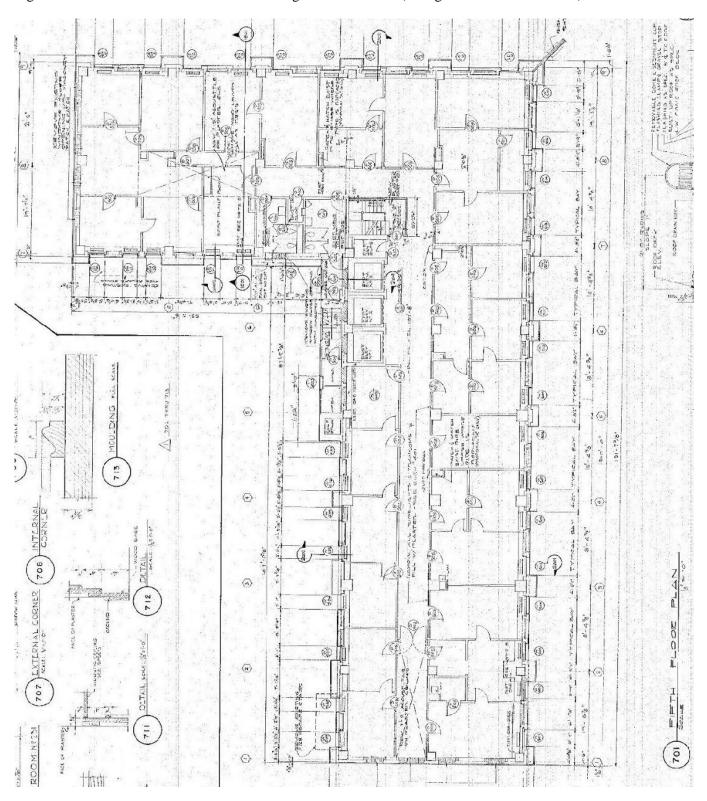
First Wichita National Bank Building Sixth Floor Plan (George Dahl Architects 1960).
